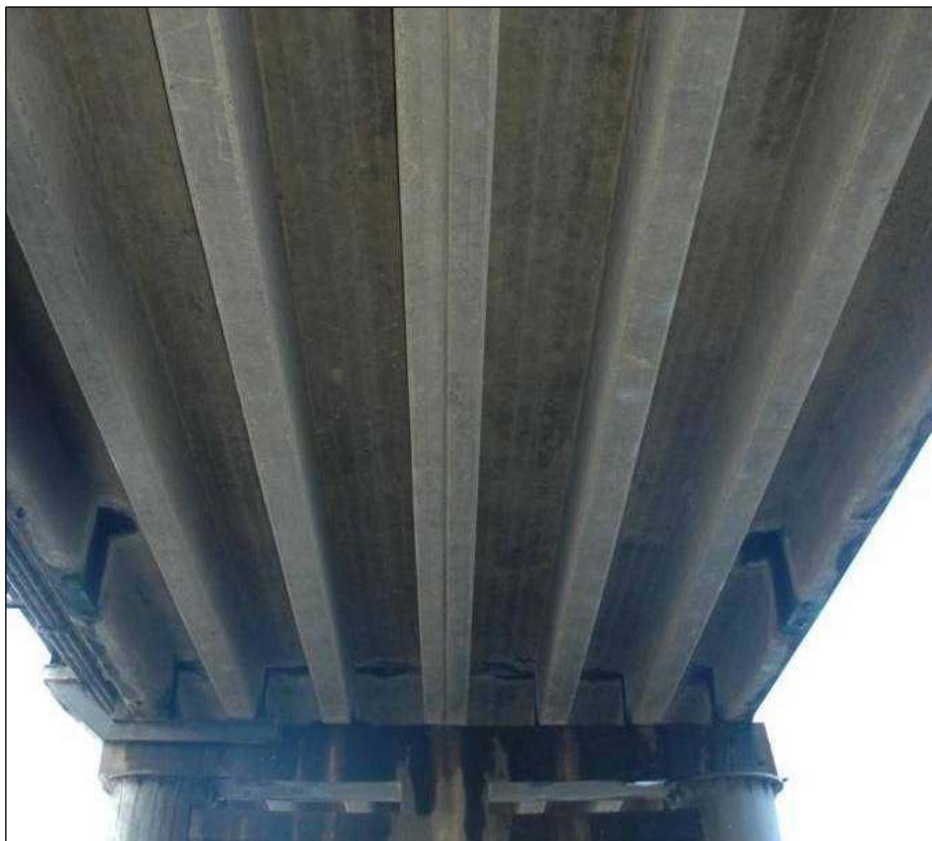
Underside view of concrete beam girders. Note the line between the central beams showing where the two sides were constructed separately.
